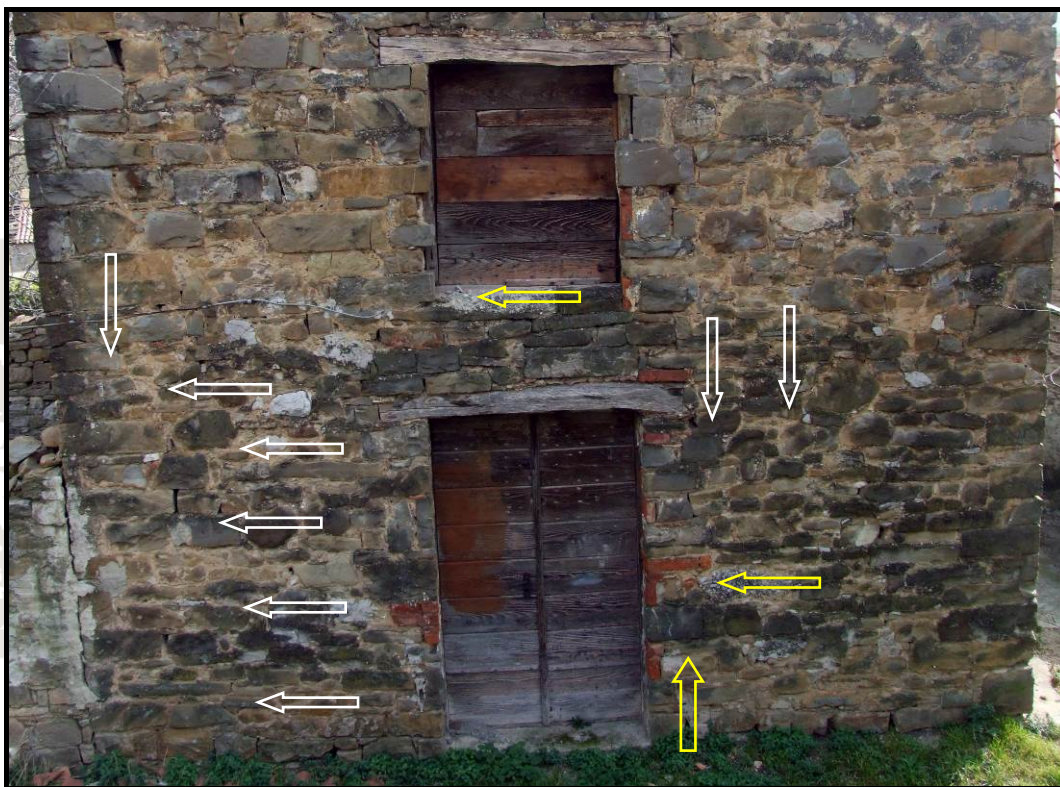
Blocks of slope breccia (yellow arrows) and flysch sandstone pebbles (white arrows) in a wall in Bagnoli-Boljunec.
